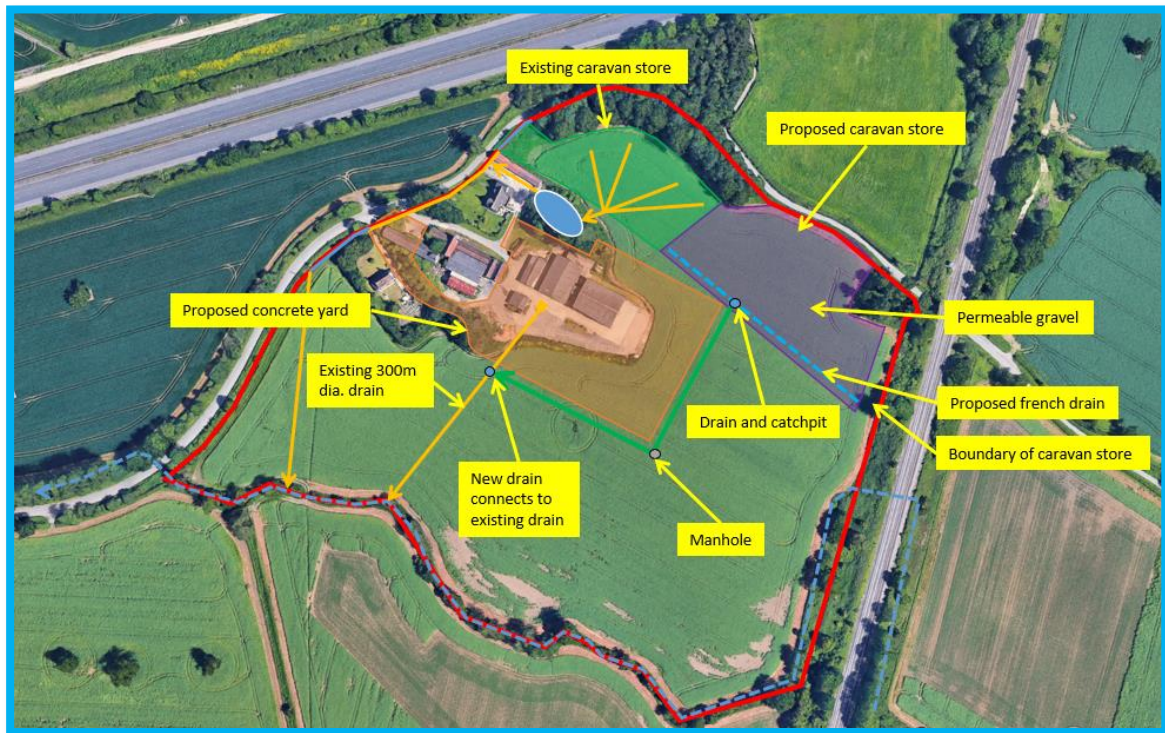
Proposed drainage in the context of the railway and wider site drainage.
